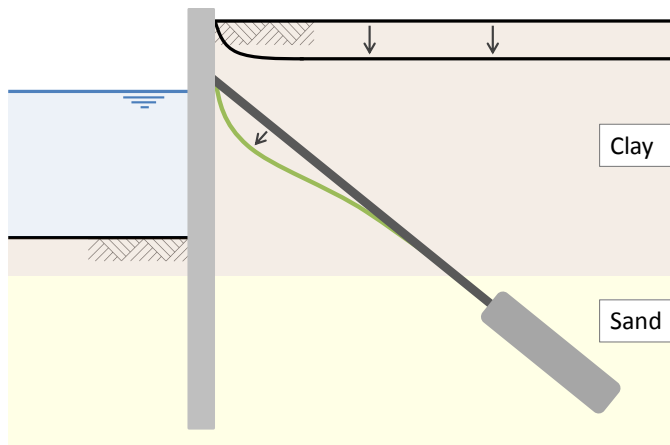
Anchorage of a construction where the subsidence of the soil causes the bar to deform.
